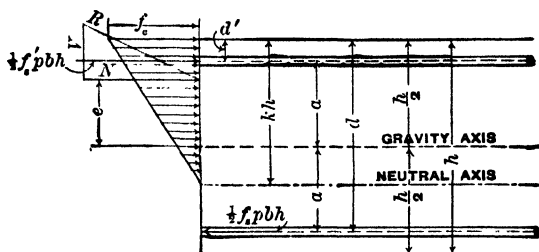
Stresses Caused by a Force Producing Compression and Tension upon a Reinforced Section, Tensile Strength of Concrete Neglected. (See p. 385.)
